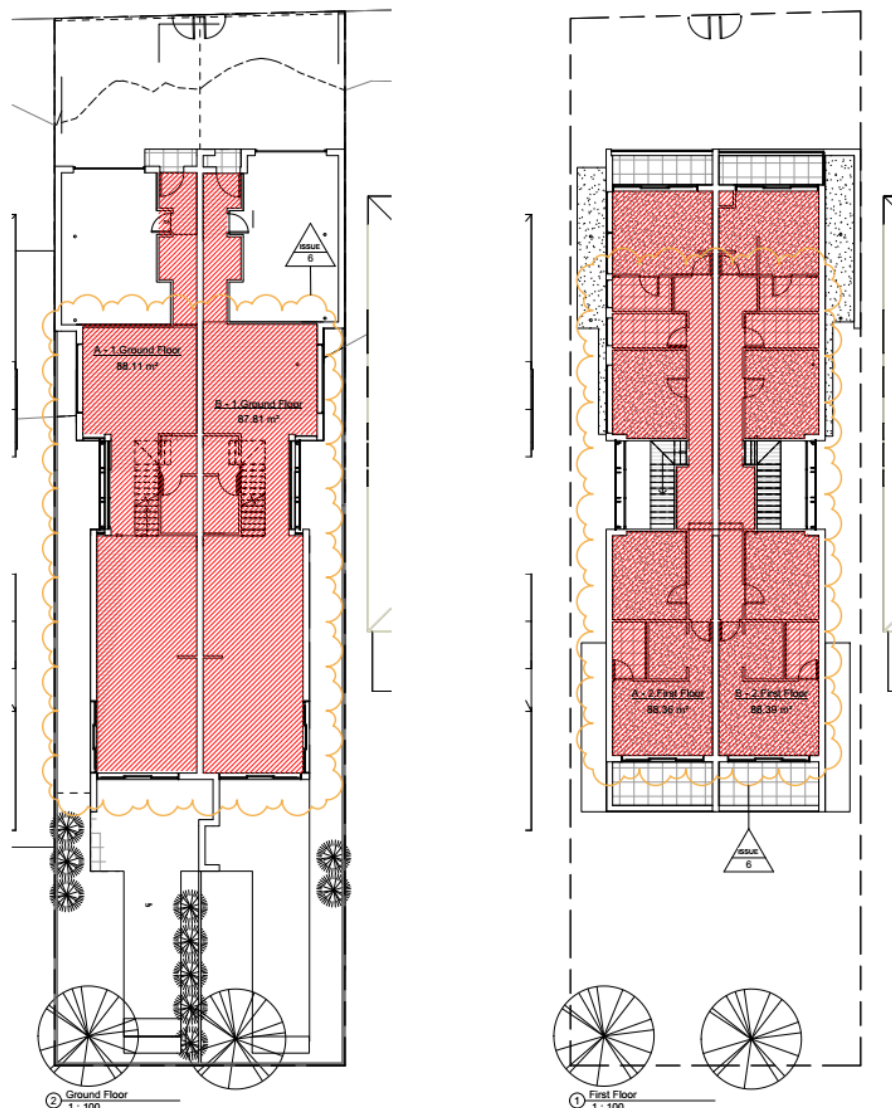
Gross floor area plan, with the areas in red included in the calculation of floor space ratio.
